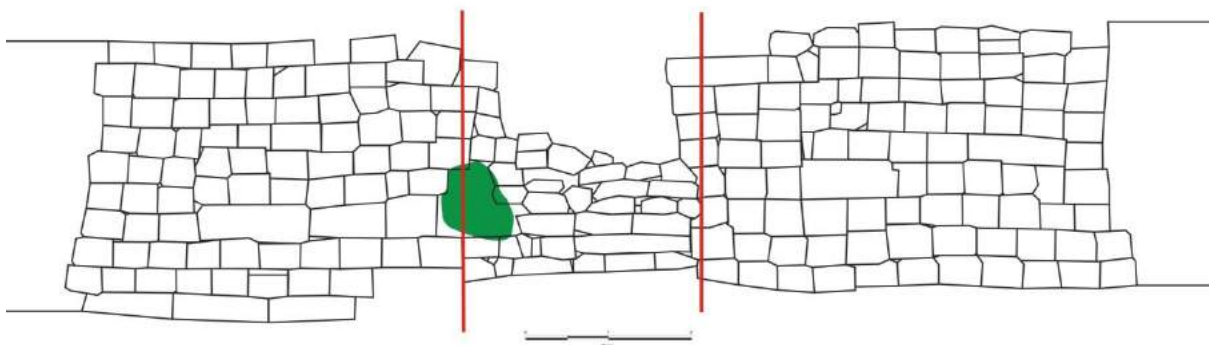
Masonry pattern of the East wall, North gateway; laterite (white) and foliage (green)
